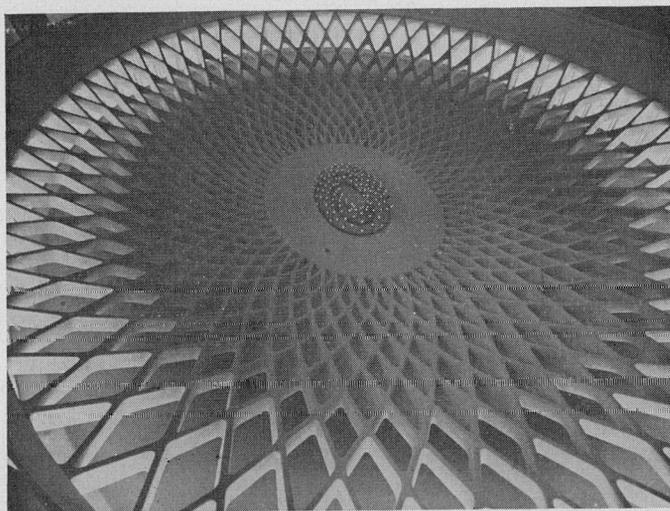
RIBBED CONCRETE DOMED CEILING.
